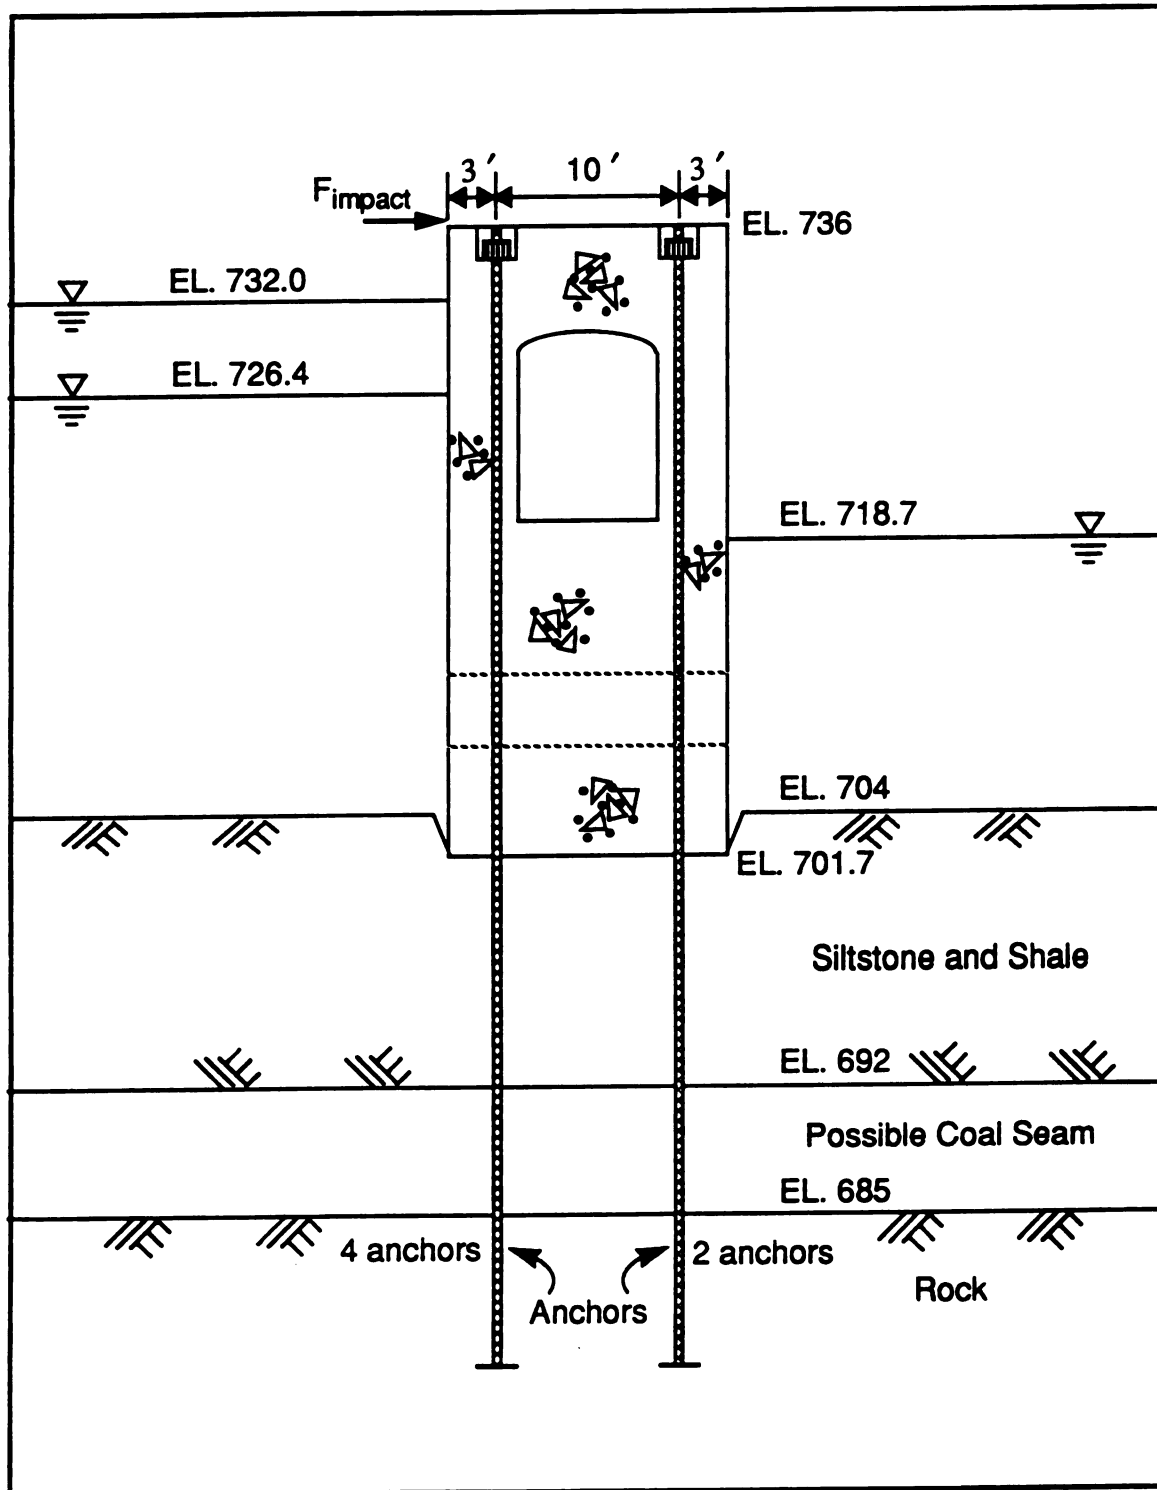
Locks and Dam No. 3, Monolith M-20, Cross-Section
